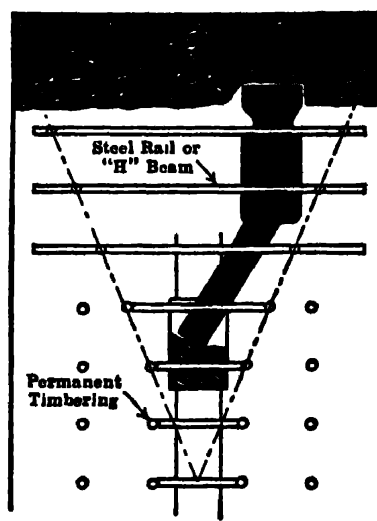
Loading with "Tunnel Timbering" and Steel Beams for Weak Roof
